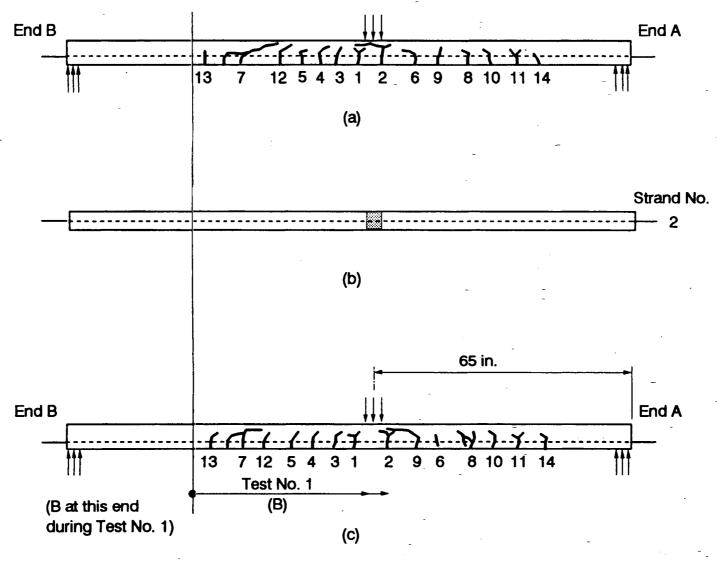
Crack pattern for D-type Specimen No. 10-6.0DU-2:
